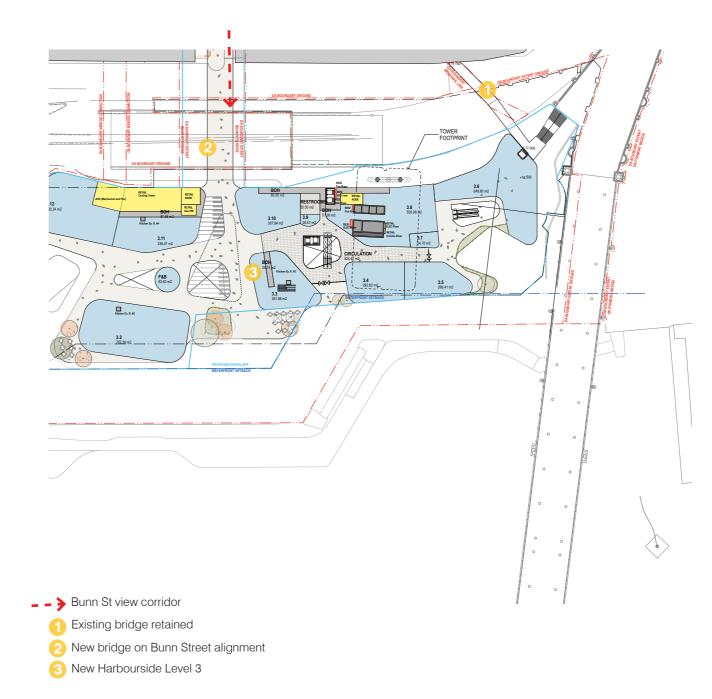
Pedestrian bridges at north end of site (Level 3)
